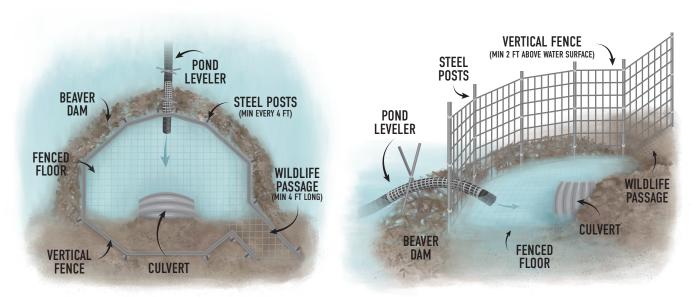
The combination of an anchor fence and pond leveler to create a pipe and fence culvert protection system shown from above (left) and side (right).
